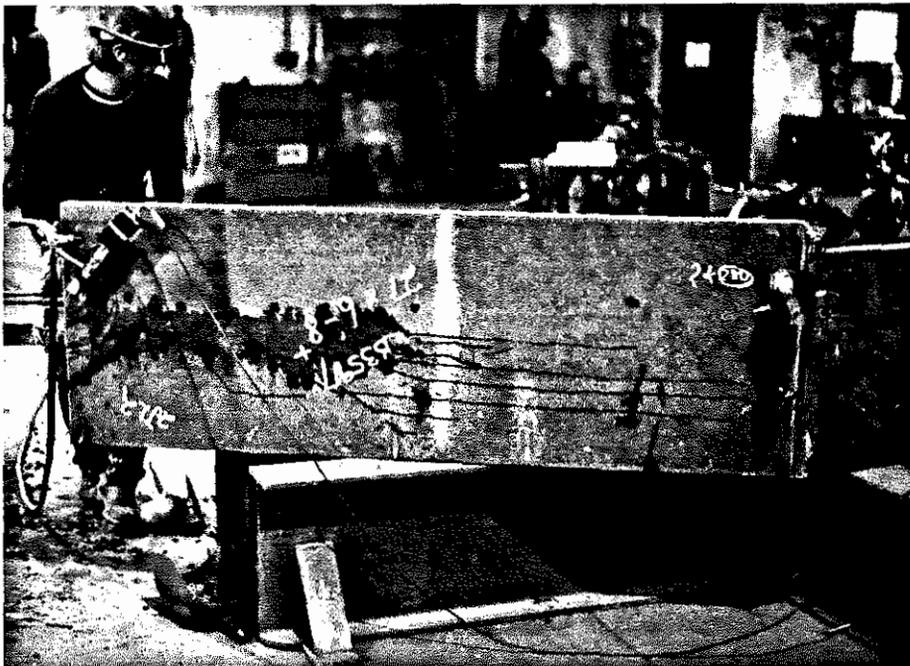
The Two Active AE Transducers Mounted on the Backside of the Flange.
